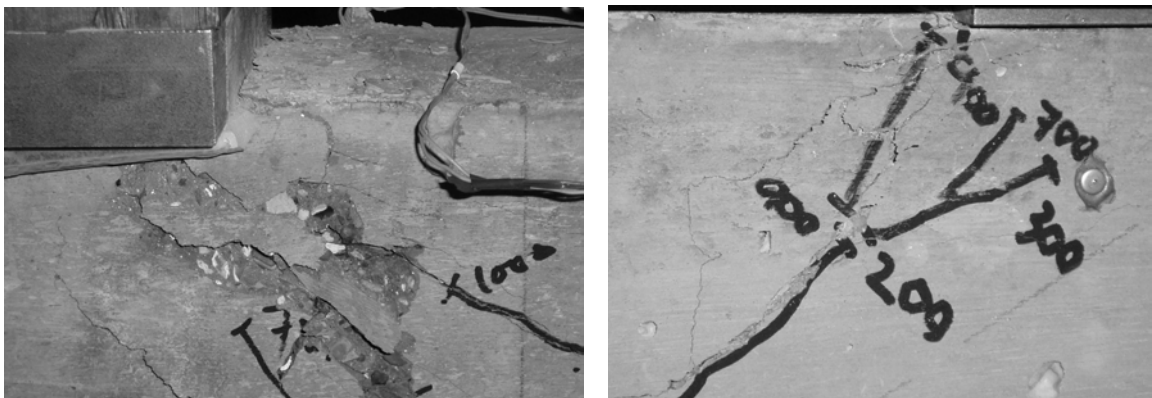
Cracks at the edge of the loading plate observed in short span beam (Beams A, refer to section 6.3)
